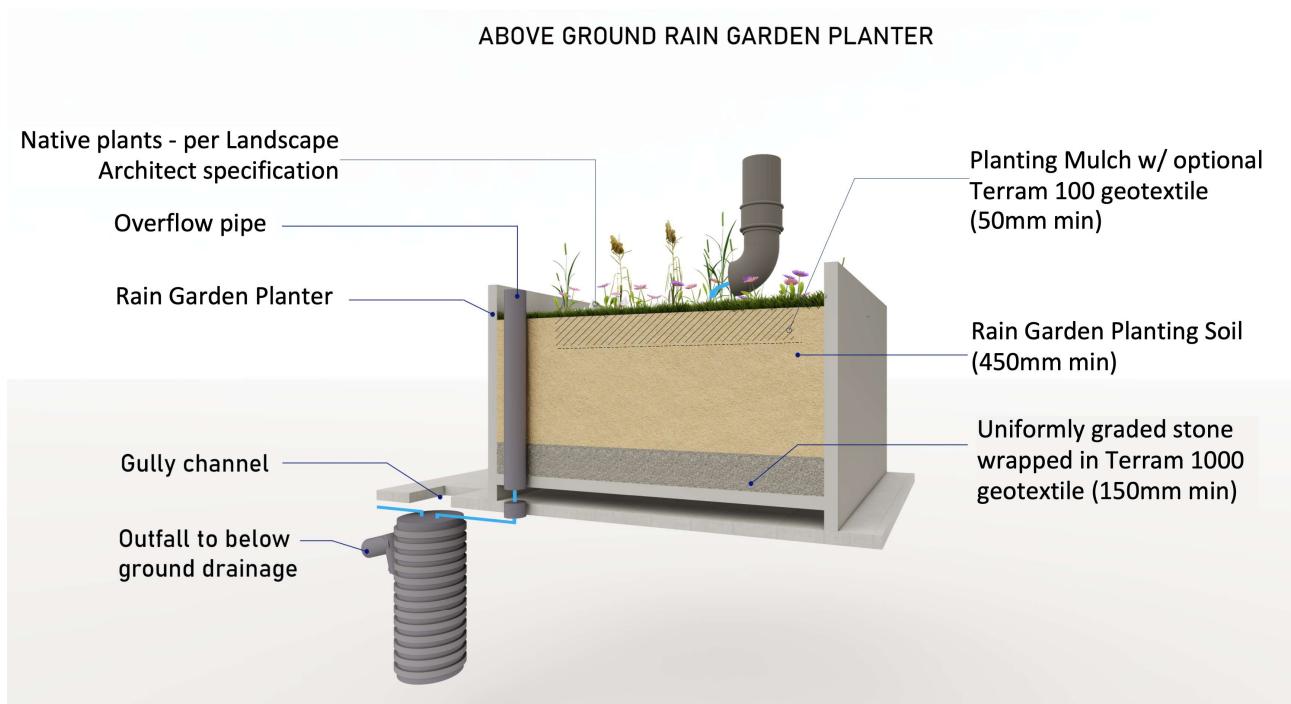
RAIN GARDEN RAISED PLANTER DETAIL
